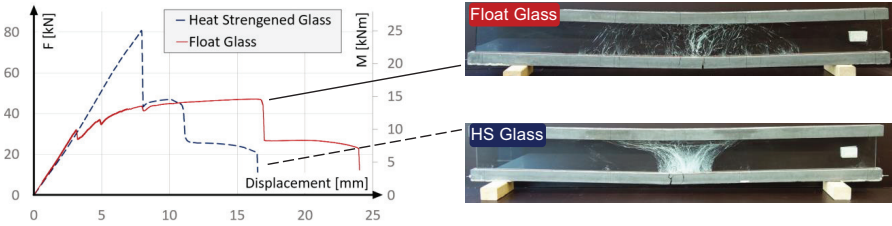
Test results of heat strengthened and float glass beams (left); cracked beams after testing (right)
